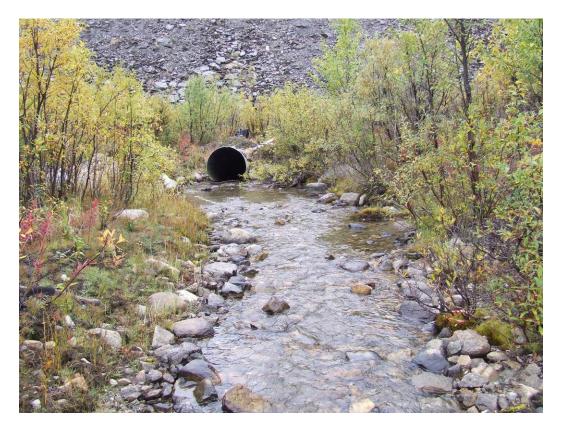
VR, upper West Fork Vangorda Creek looking downstream to the culvert, Sept 2, 2010.
